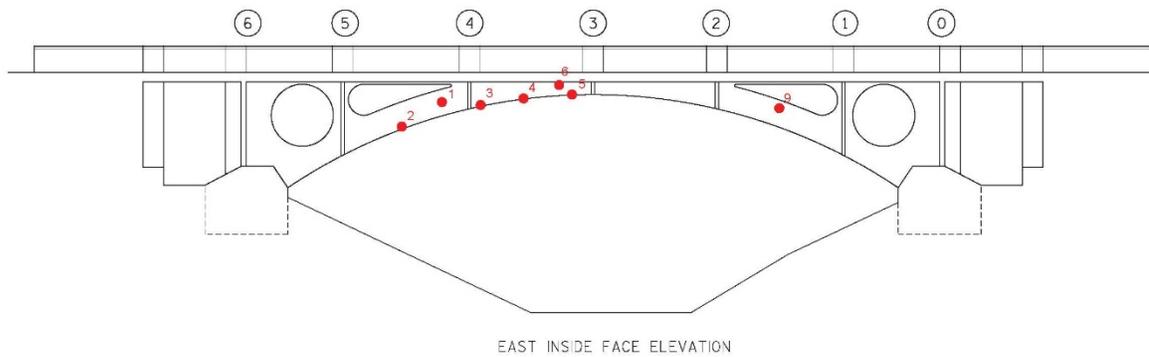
IMPACT ECHO TEST LOCATIONS
